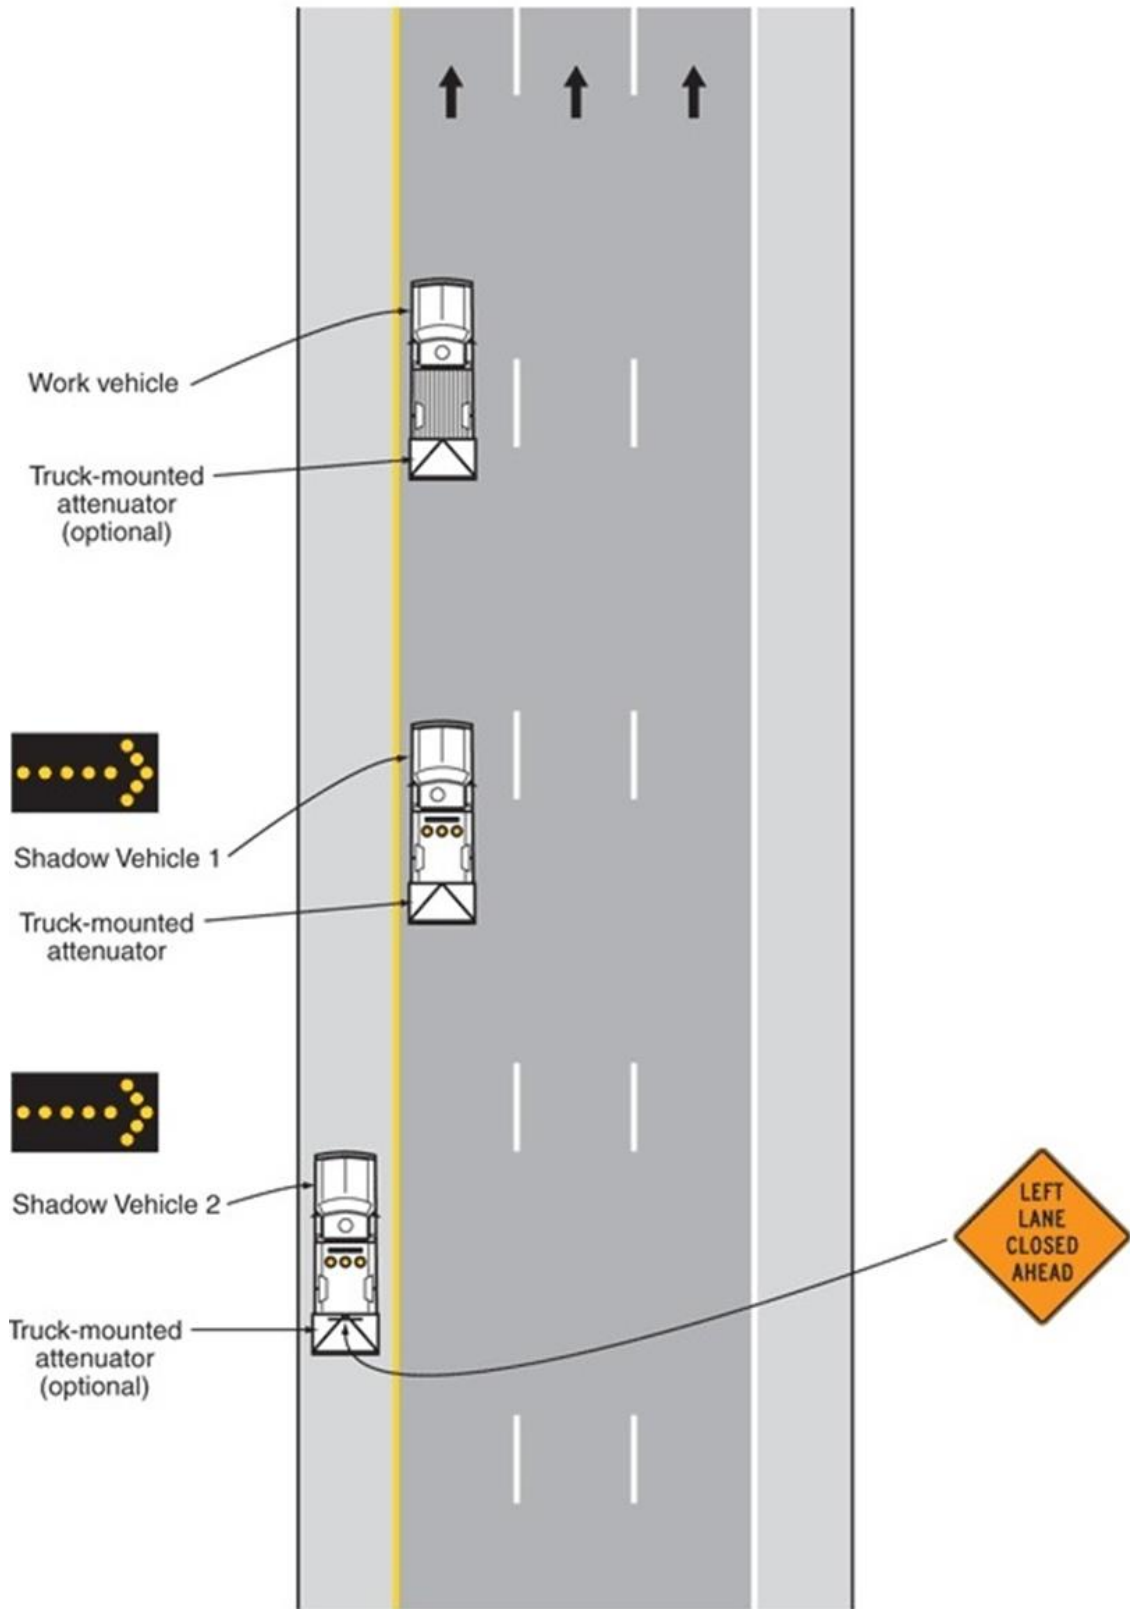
MUTCD typical application sheet for mobile work zone layout (FHWA, 2009)
